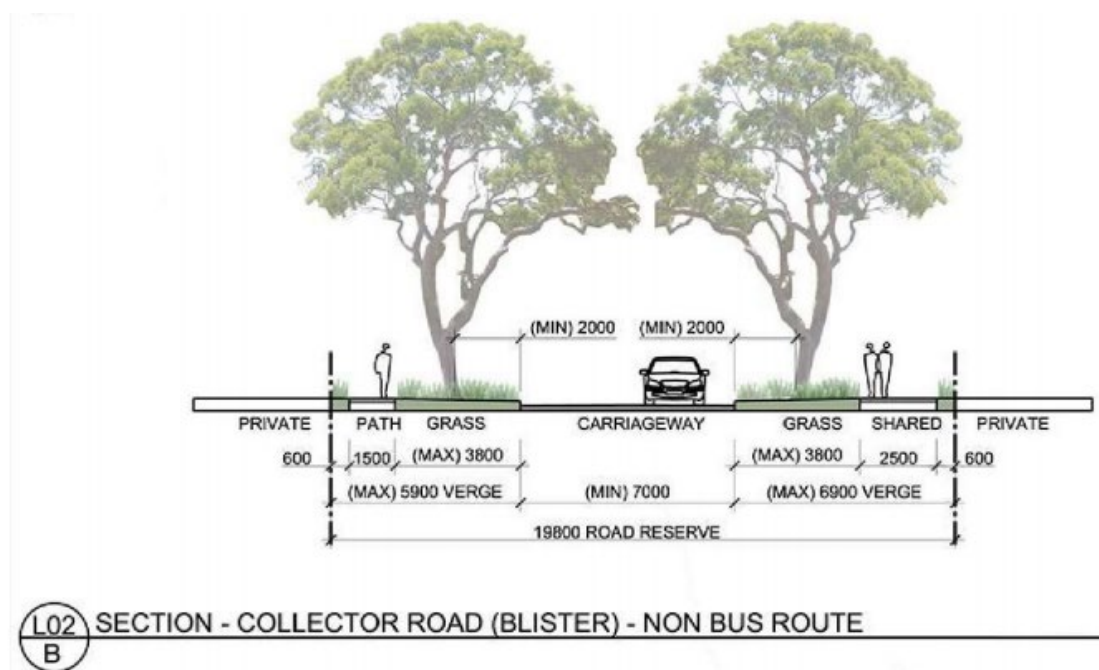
Typical Road Sections – Collector Road (Non Bus Route)
